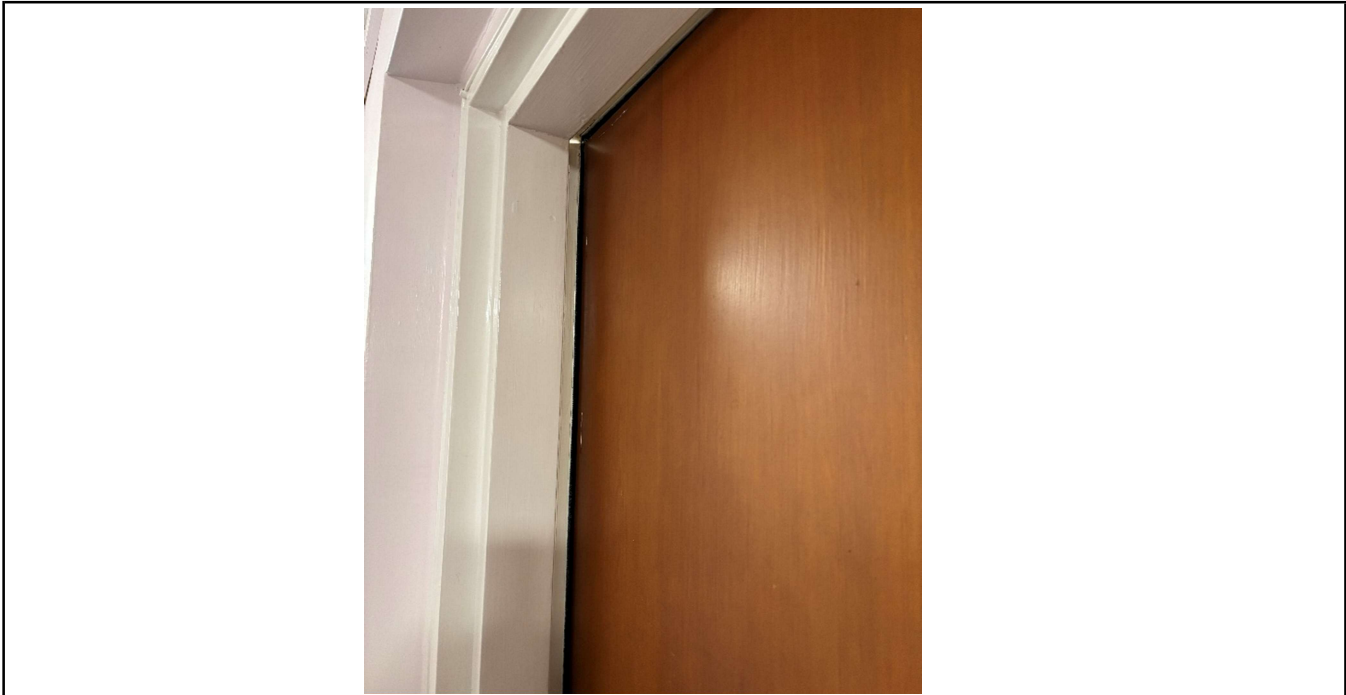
Communal Fire door opposite flat 11 requires ease and adjust to close to rebate.
